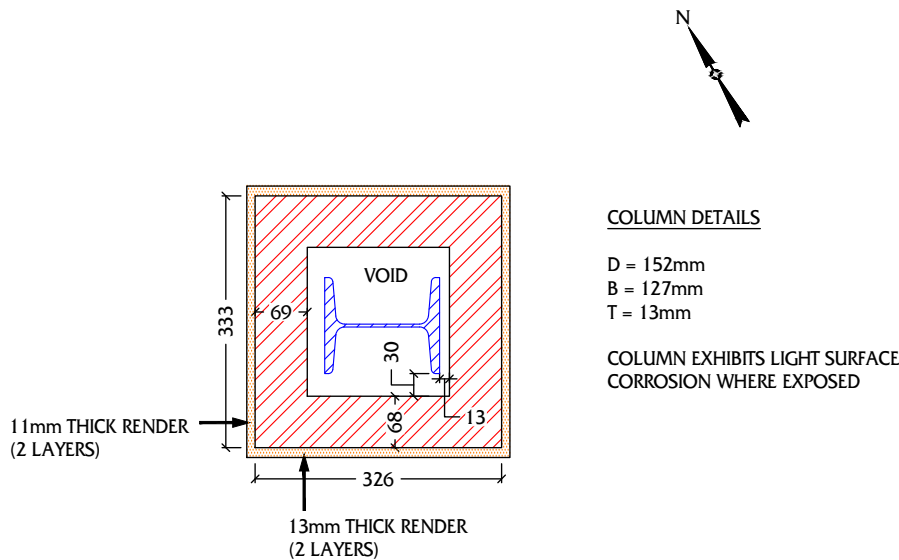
PART PLAN SHOWING DETAILS OF COLUMN N11 SCALE 1:10
